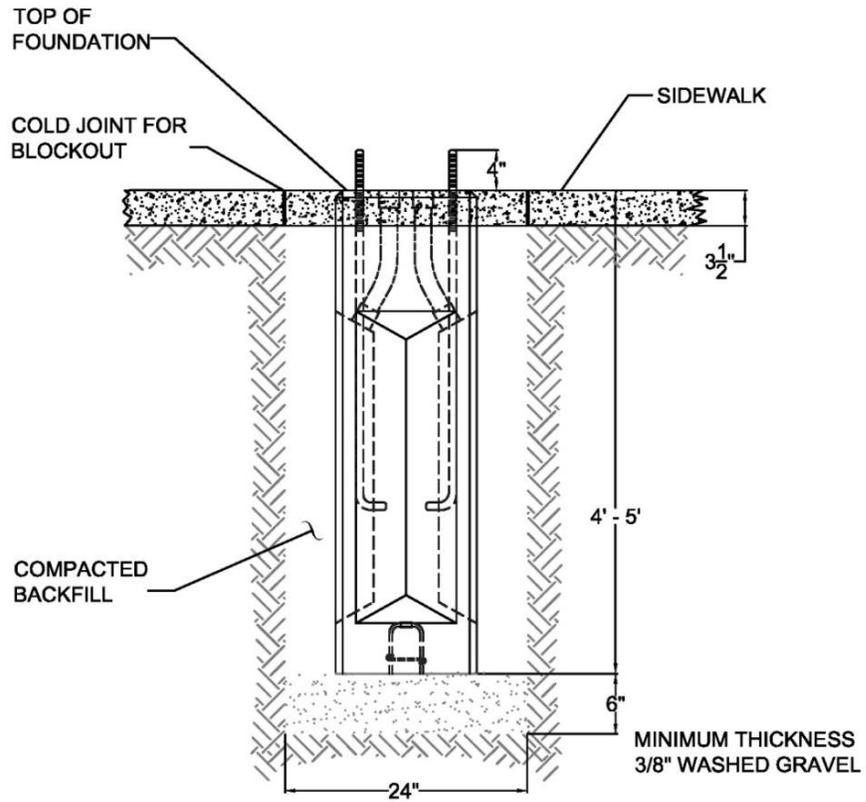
Requirements for In-Earth, With Incline, Installation, Elevation View
